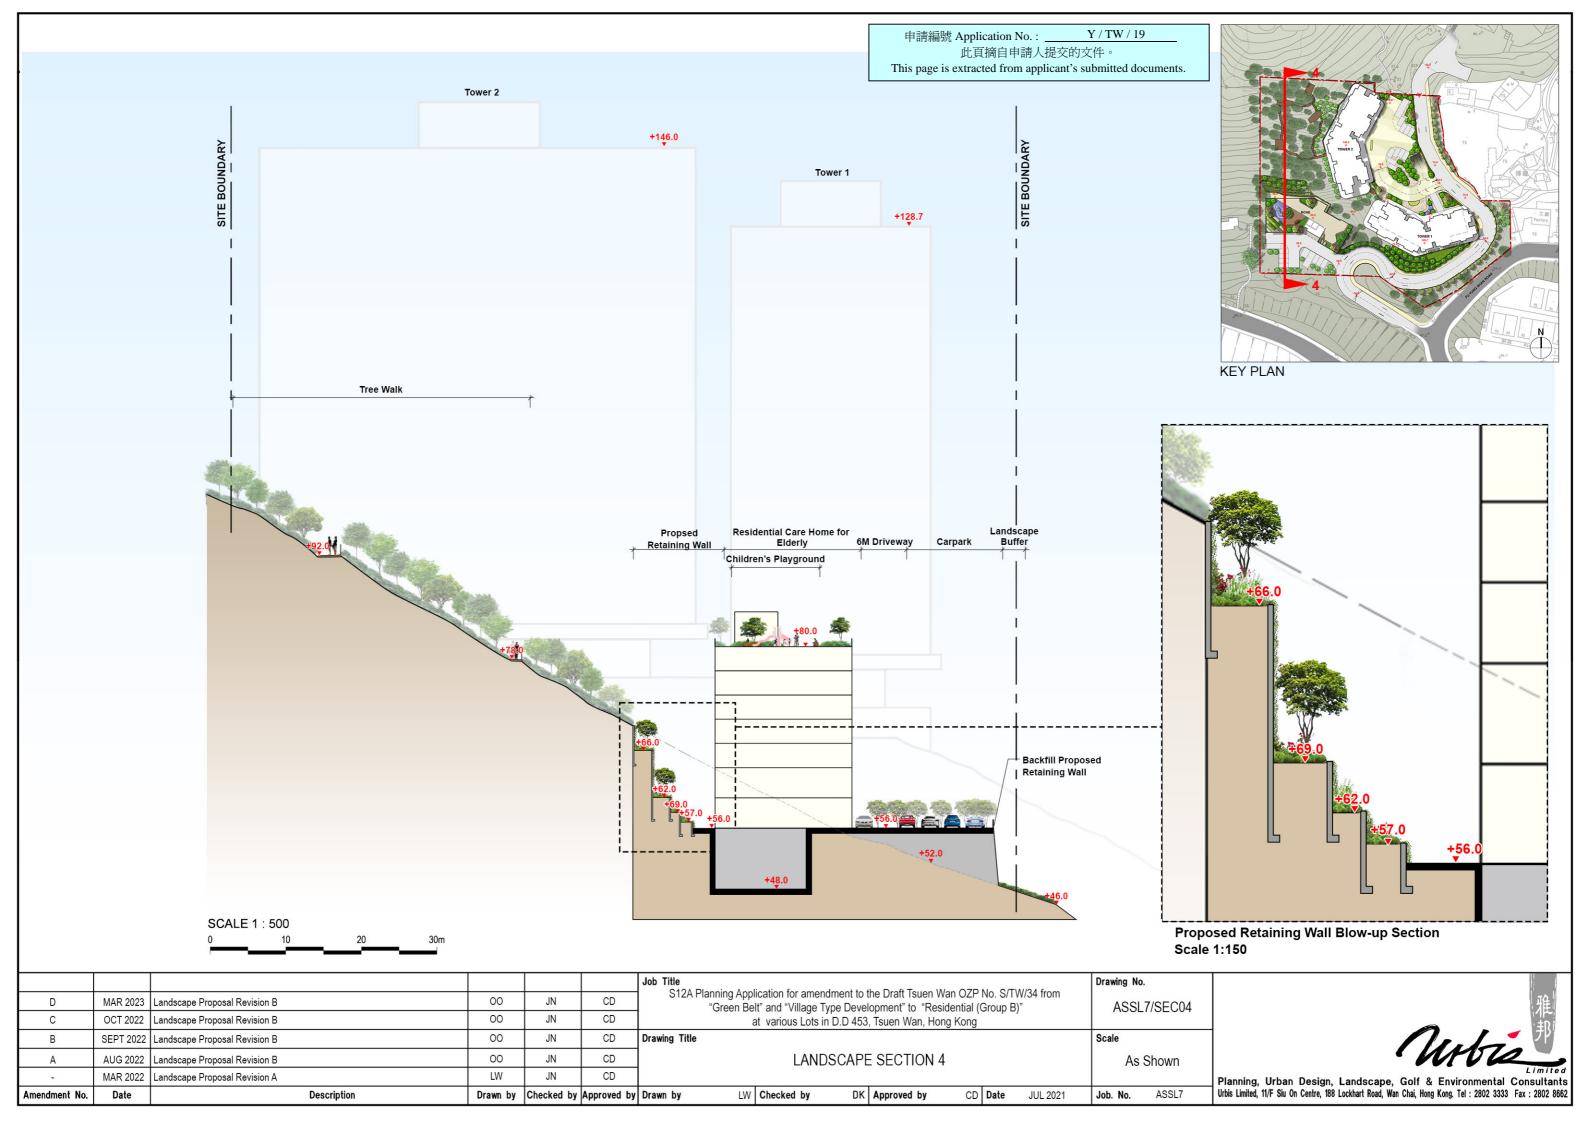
EXTRACT OF LANDSCAPE MASTER PLAN
